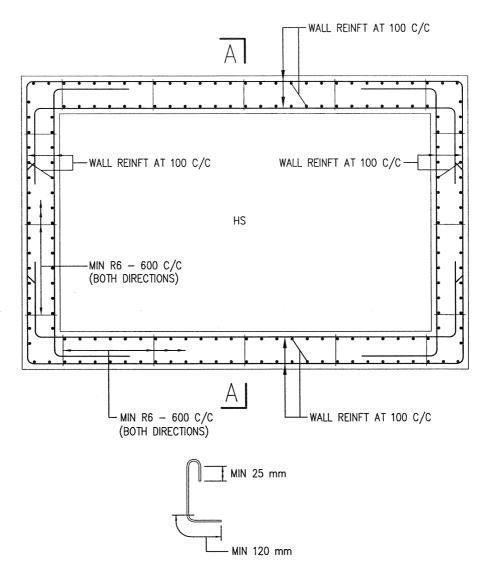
MINIMUM DIMENSIONS OF CEILING SLAB
